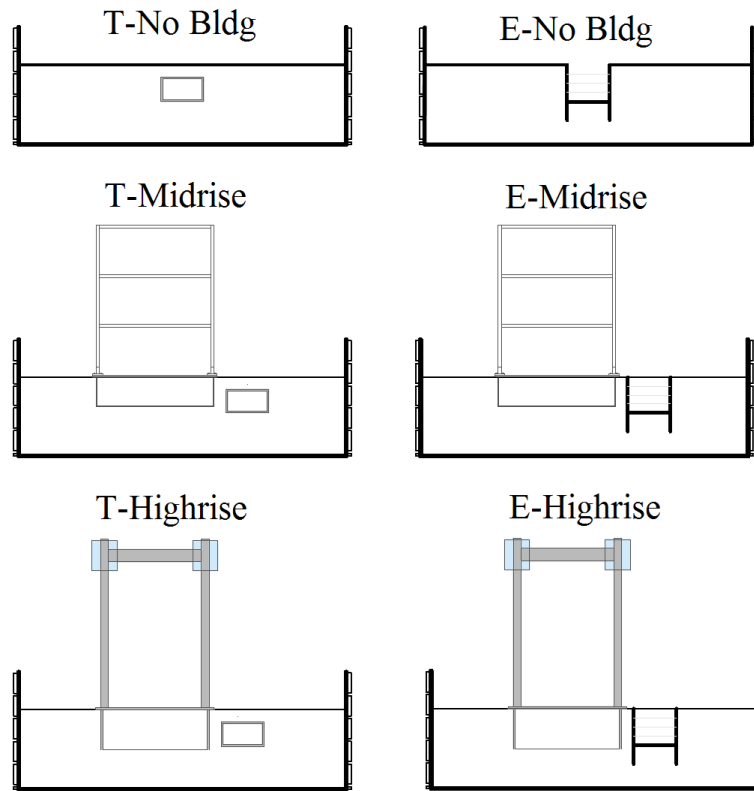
Schematic drawings of the centrifuge testing plan.
